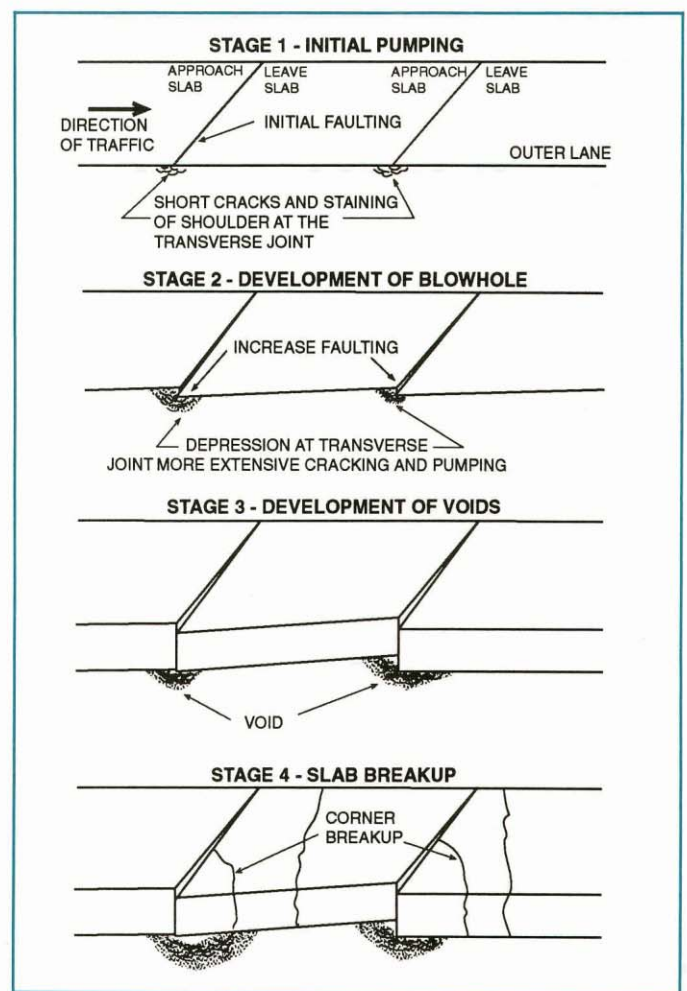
Typical stages of loss of support and void development leading to concrete pavement deterioration.
